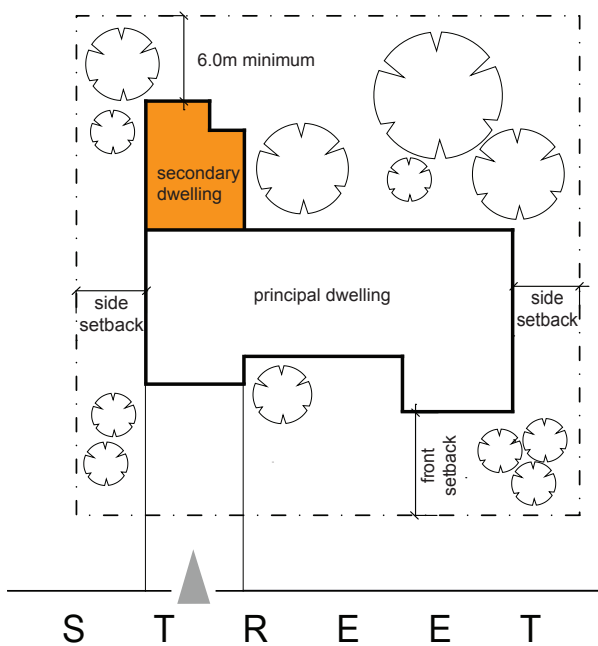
A.3-1: Setback controls for attached secondary dwellings.
